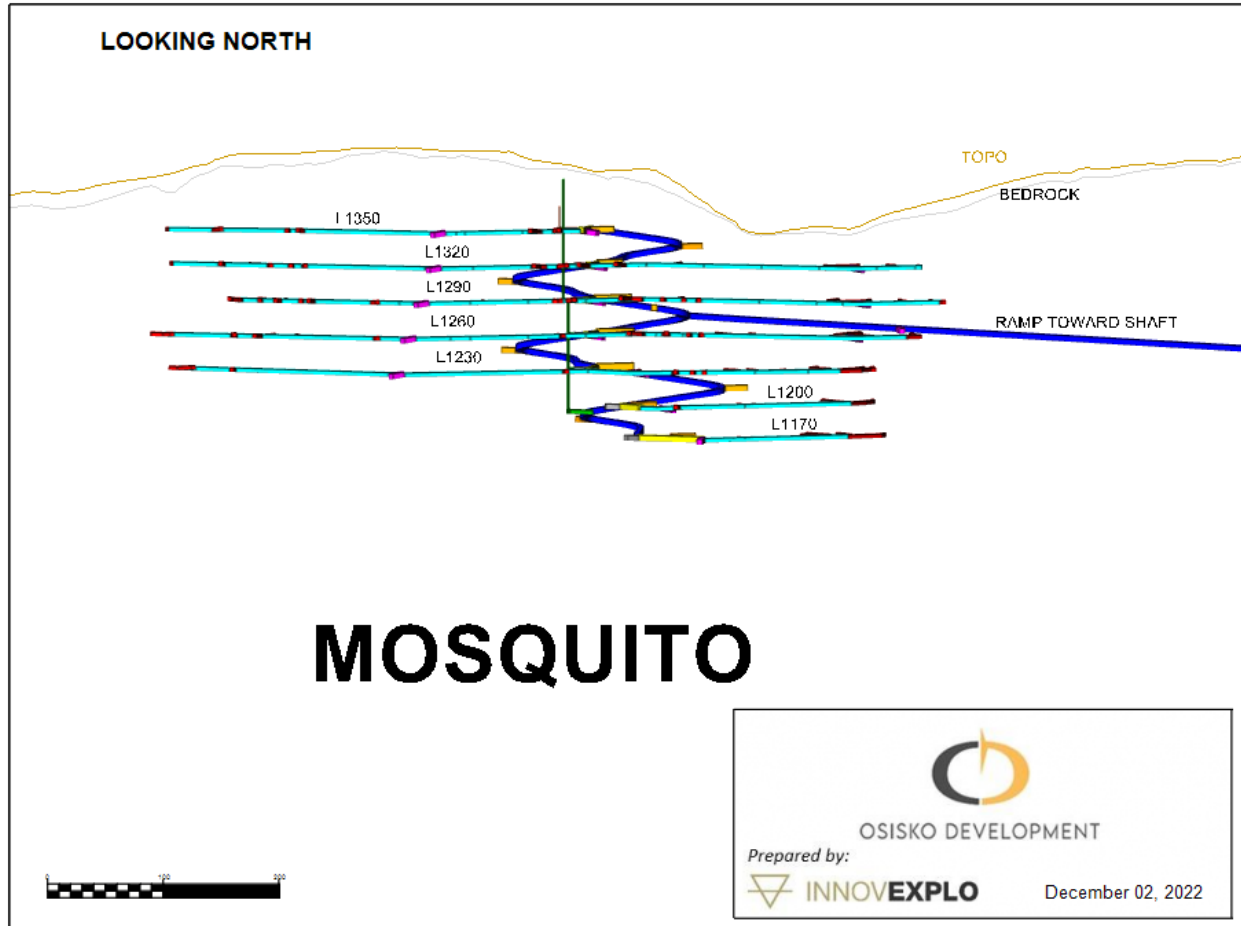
Longitudinal section of Mosquito Zone looking north
